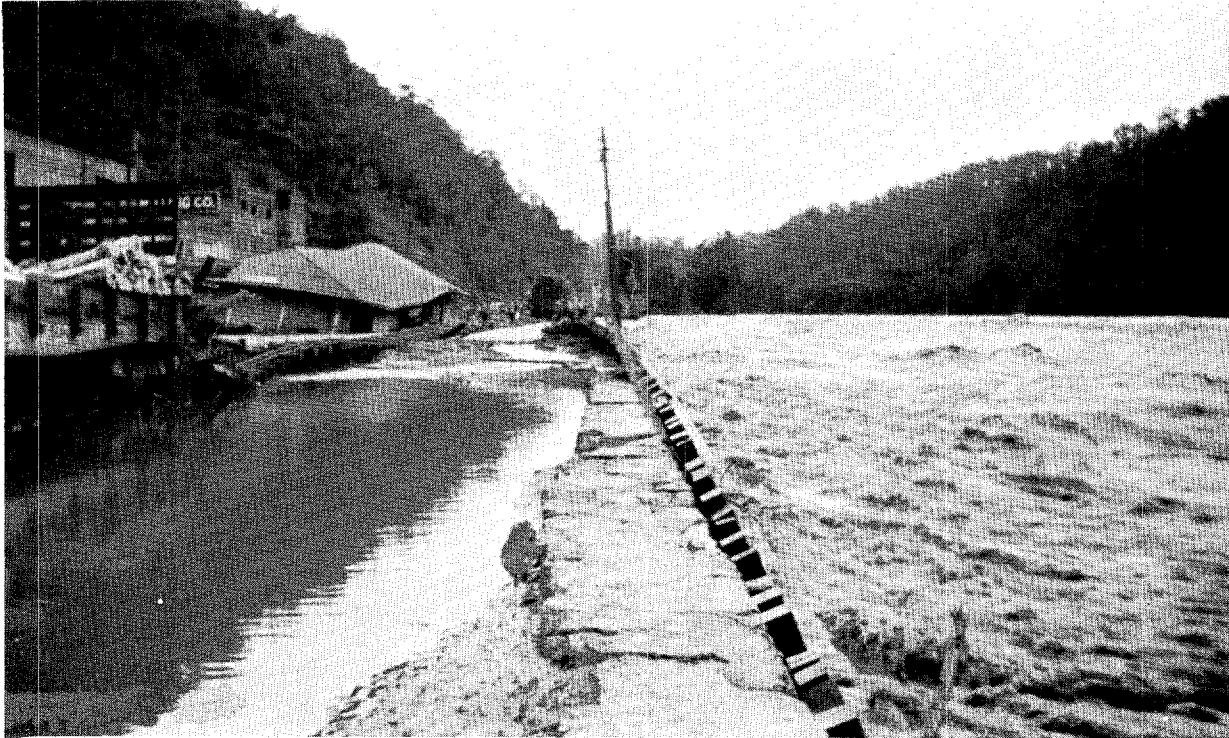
RAILROAD TRACK DAMAGE IN 1940
